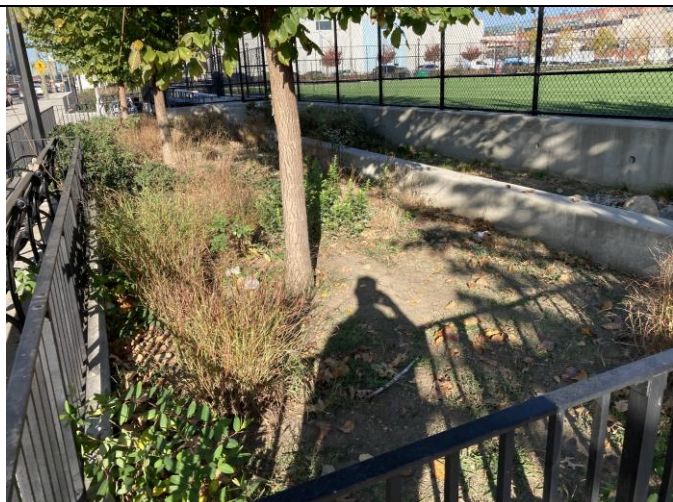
Additional mulch needed at Planting Area along Bay Street.
